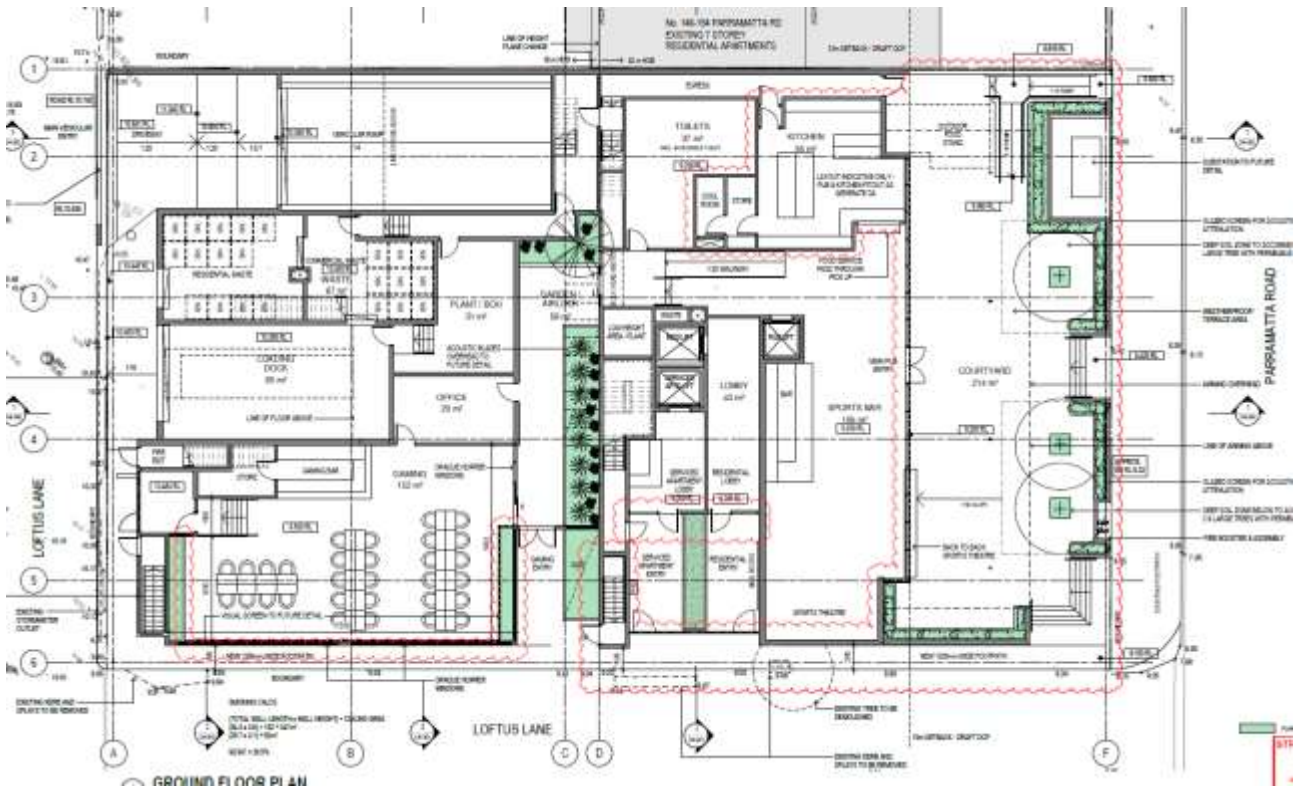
Extract of the proposed ground floor of the building which predominately comprises the pub
